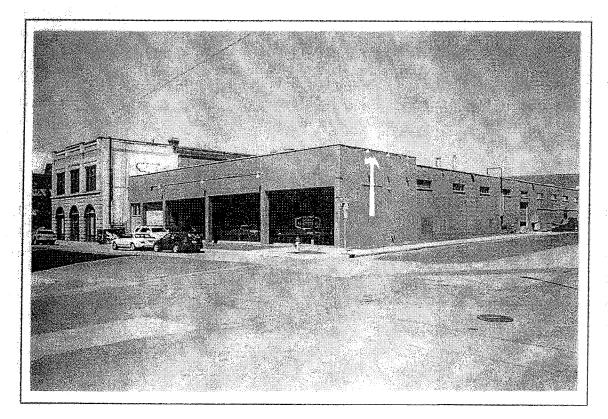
View to Northwest Looking at Site, NW Corner of Pacific Avenue and McClellan Street
